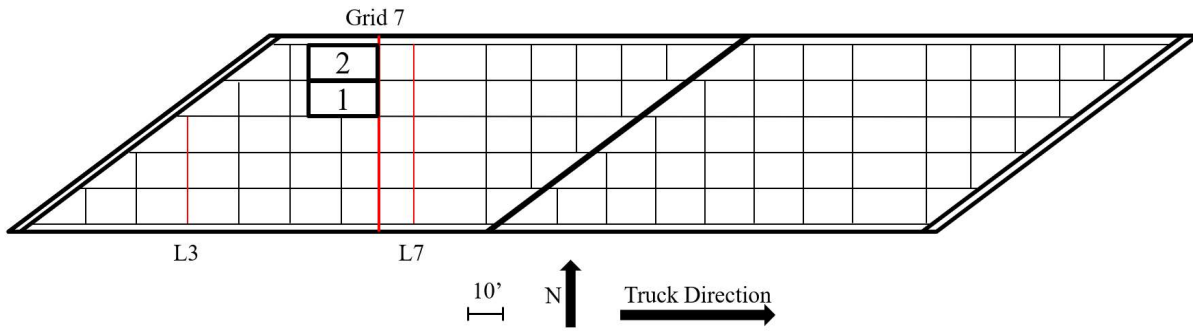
Lubbock Bridge Load Case 4: Side-by-Side North
